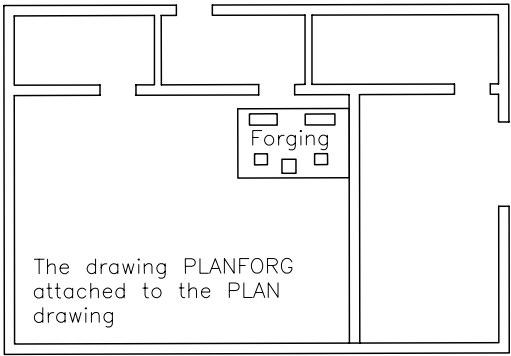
The PLAN drawing after attaching the PLANFORG drawing
